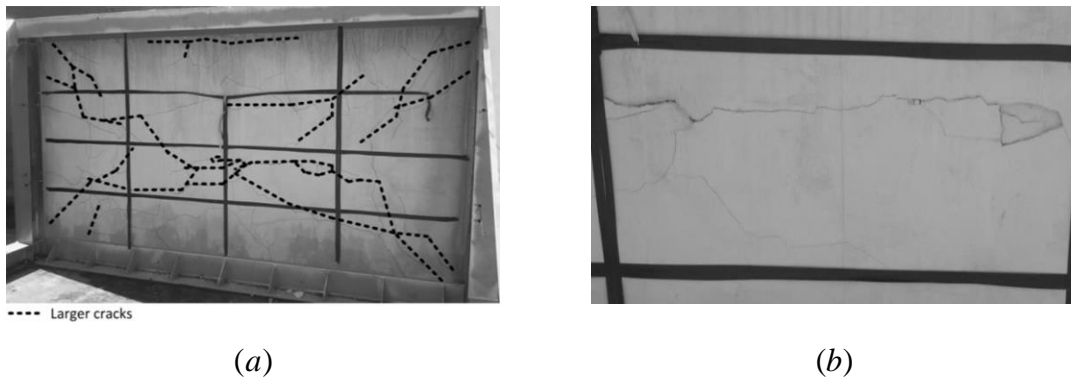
Damaged wall after blast test: (a) full panel; (b) zoom on the center of the panel (2nd row and 3rd column quadrant, from bottom-left) [16].
